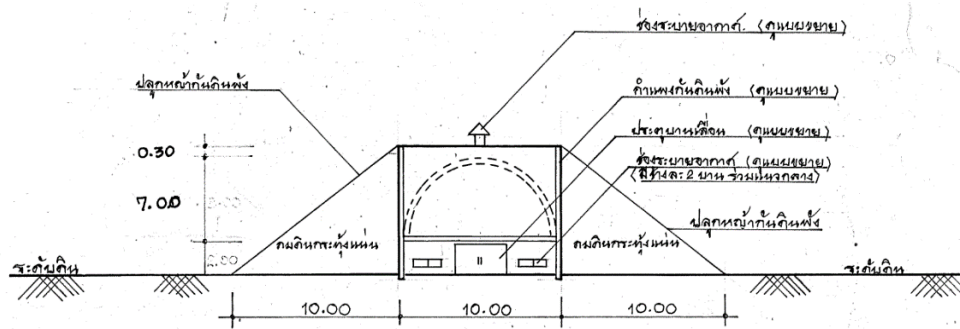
Construction drawings of the existing Ammunition storage in Thailand
